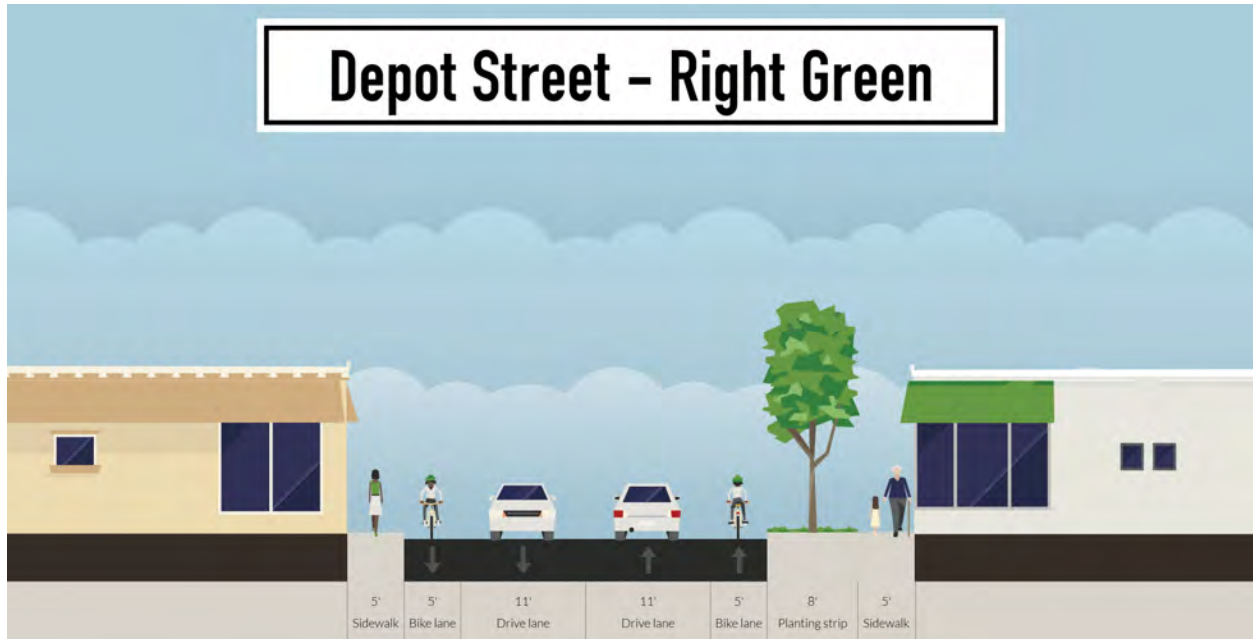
DEPOT STREET CONCEPTUAL PLAN, MANCHESTER: EXAMPLE SECTION
